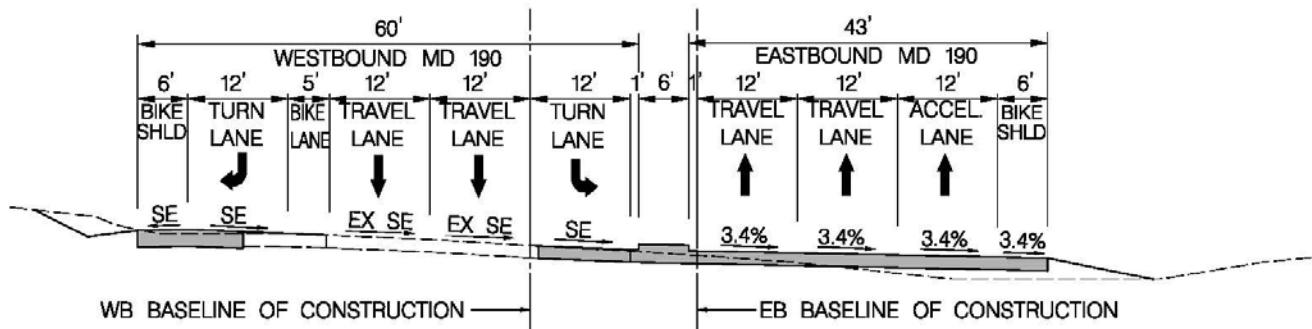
Alternative 3 - MD 190 Intersection West of Pyle Road
